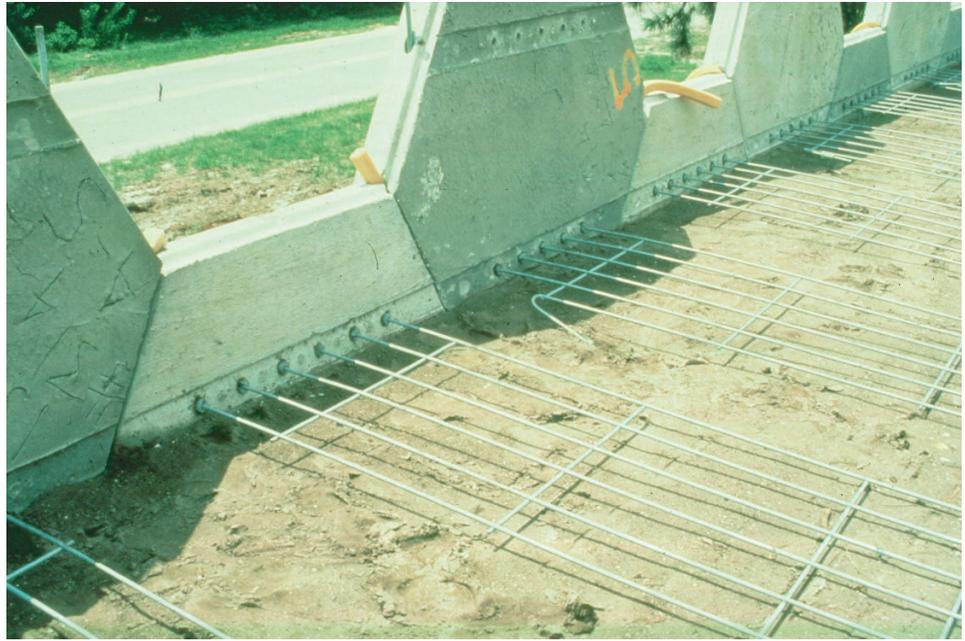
Mechanically Stabilized Earth Wall Under Construction
